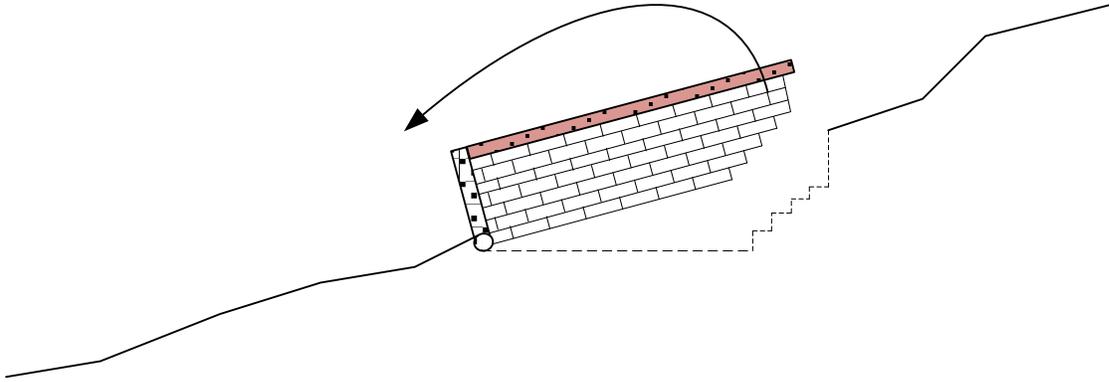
External seismic stability failure involving overturning of an entire vertical embankment about the toe of the embankment.
